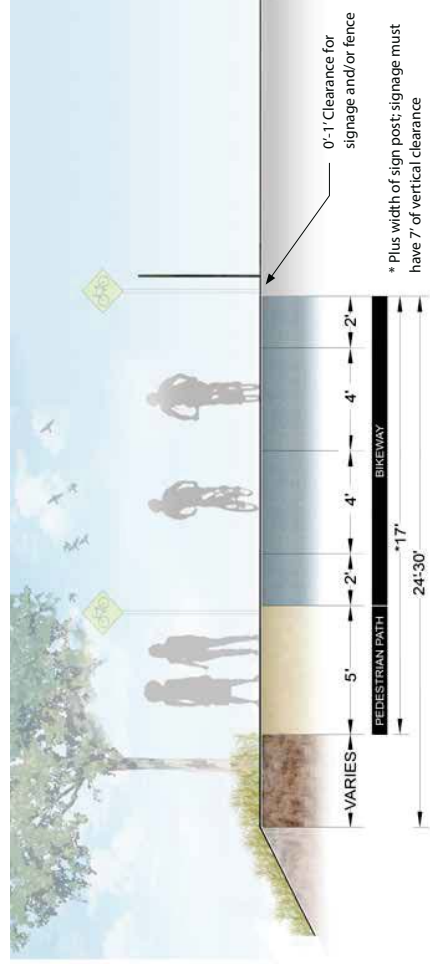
Balboa Boulevard to Burbank Boulevard (South Side) - Typical Cross Section
